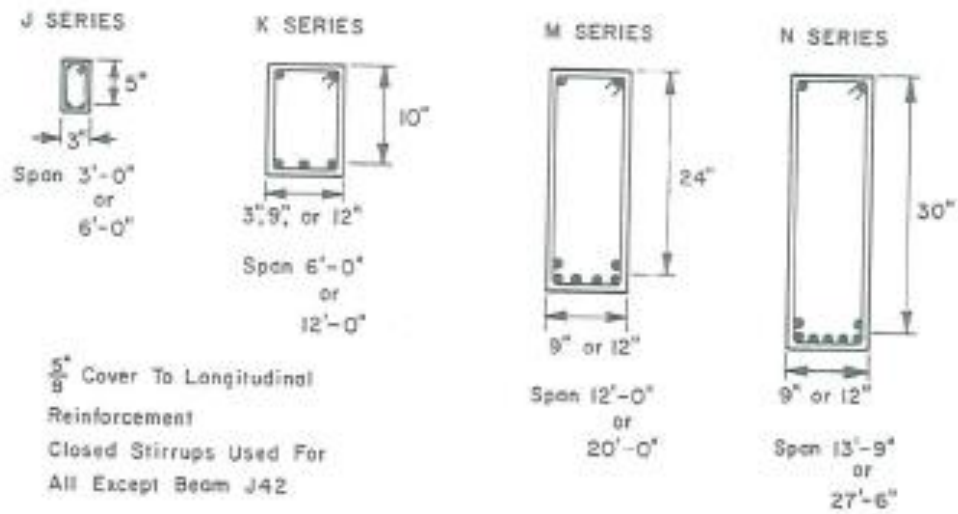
Corley. Beam test Cross section and steel bars configuration
